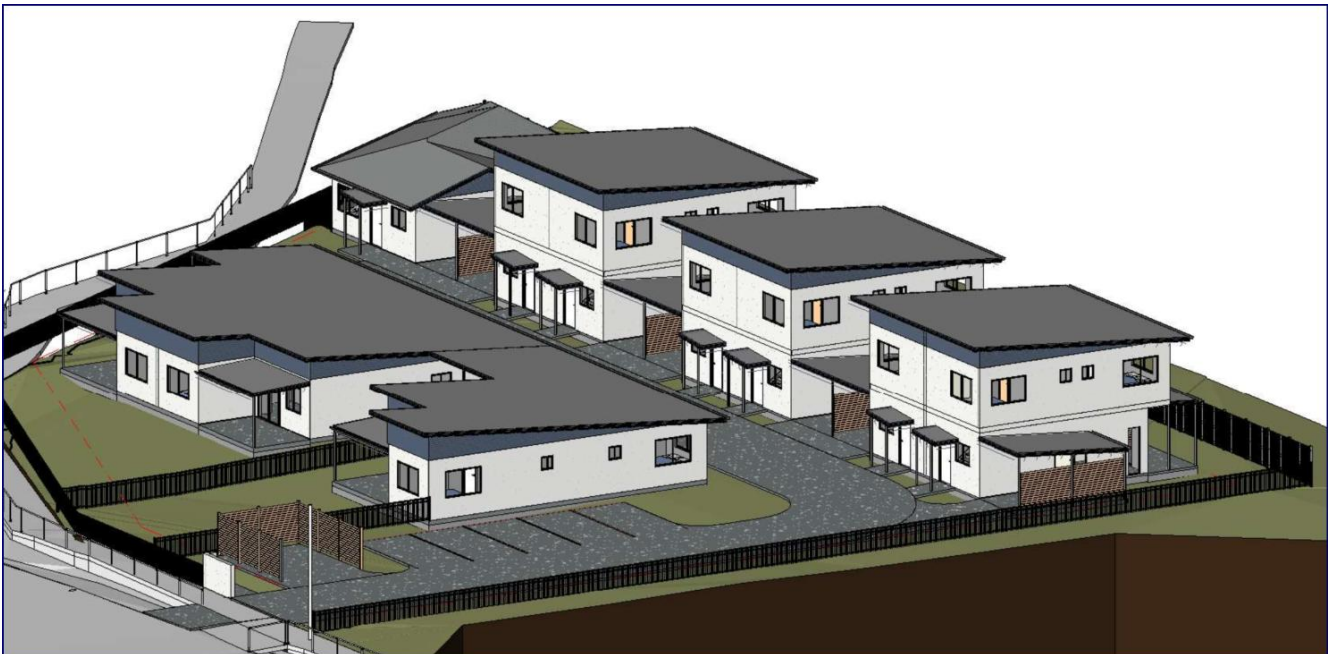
Proposed Development 3D Render (source: Troy Martin Architect)
